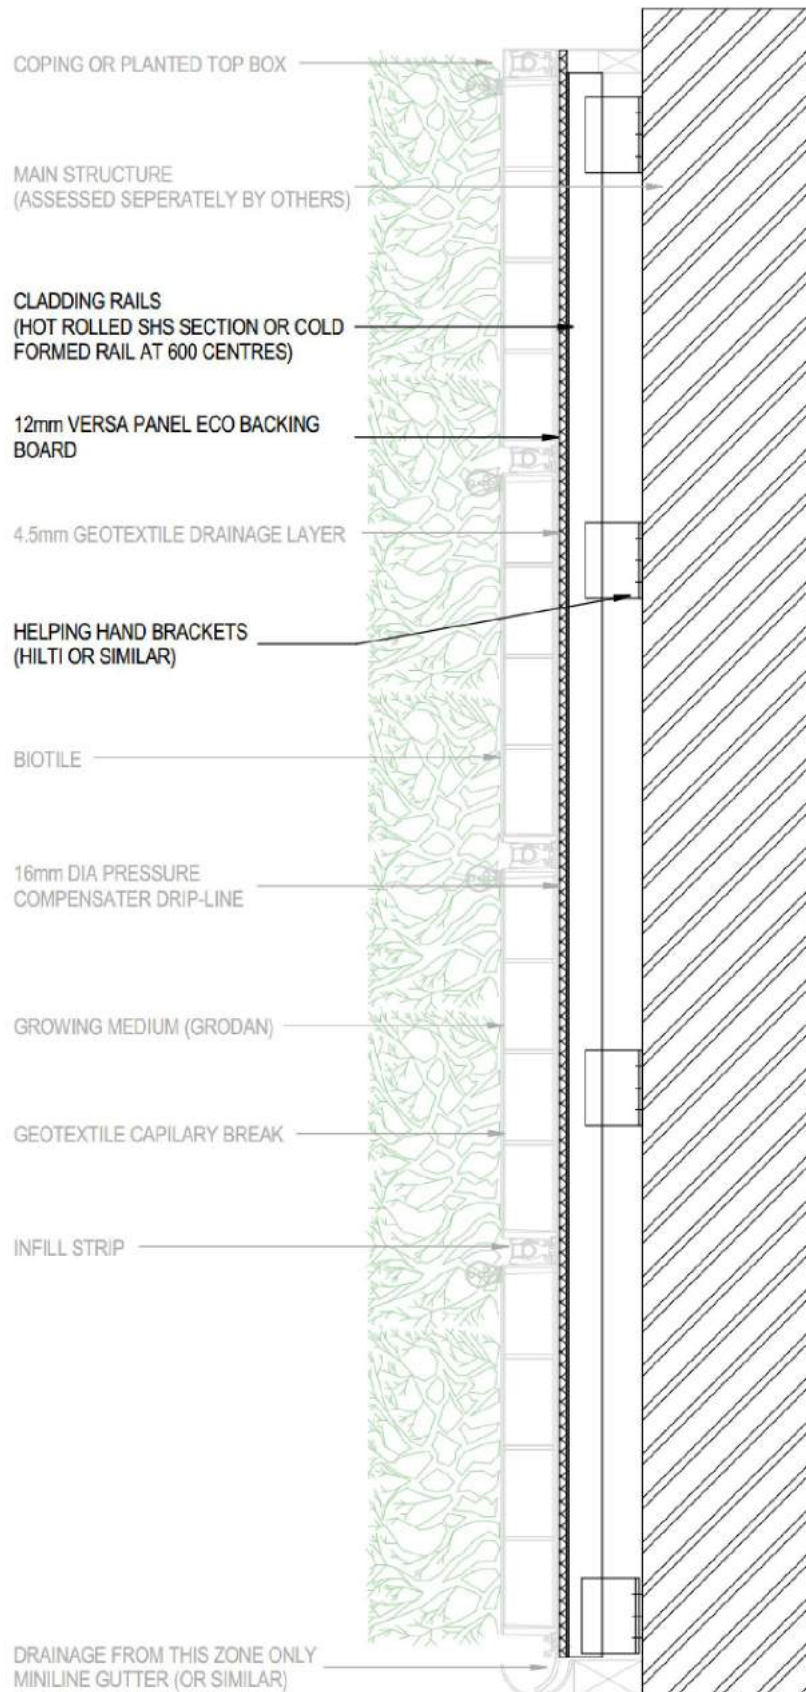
Typical Cross Section (note: secondary structural components highlighted in bold)
